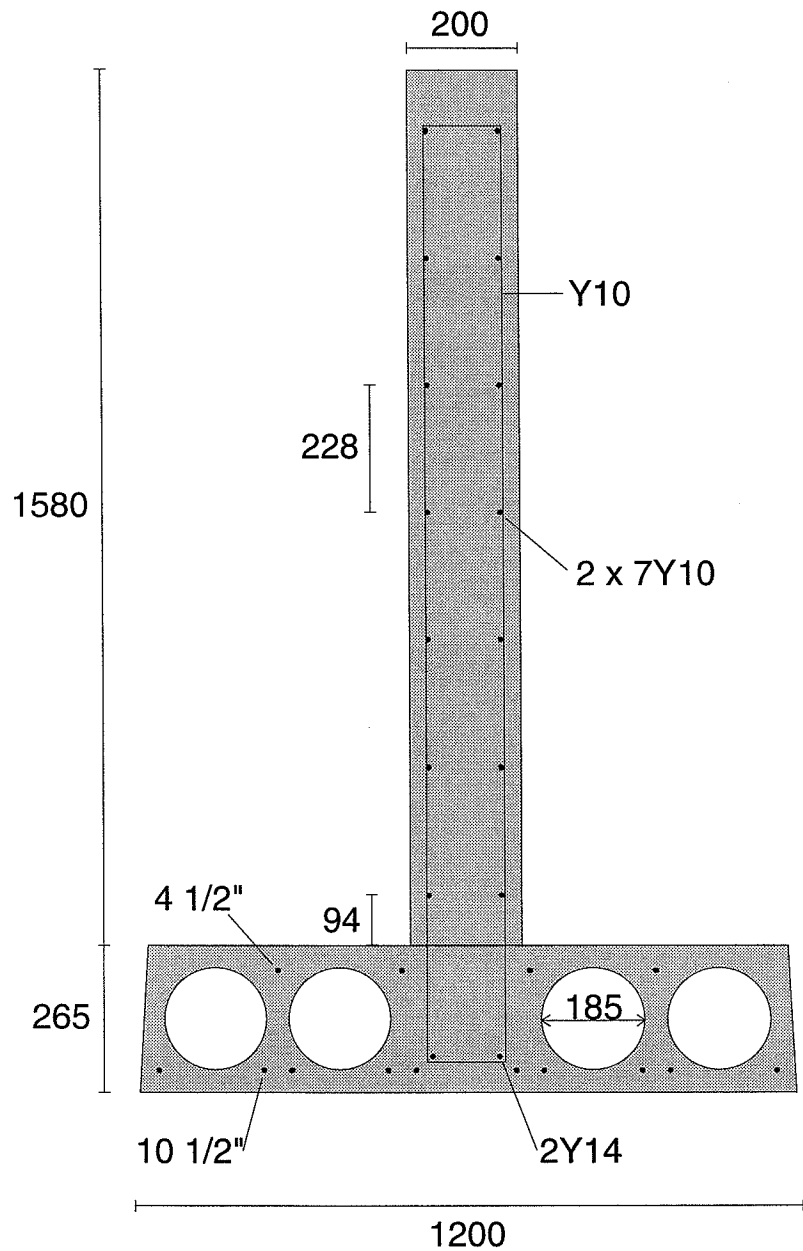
Cross-section dimensions and reinforcement arrangement. The lines were prestressed with an effective elongation of 6%. The dimensions of the stirrups were 140 x 1695 mm; they were positioned at 200 mm intervals.
